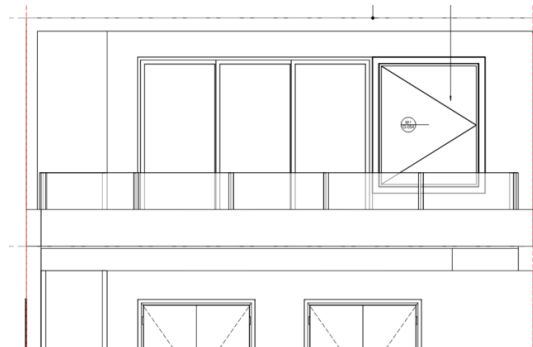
Approved level 2 front elevation under DA/660/2003/C - 7/274 Arden Street, Coogee (Source: Place Studio)
